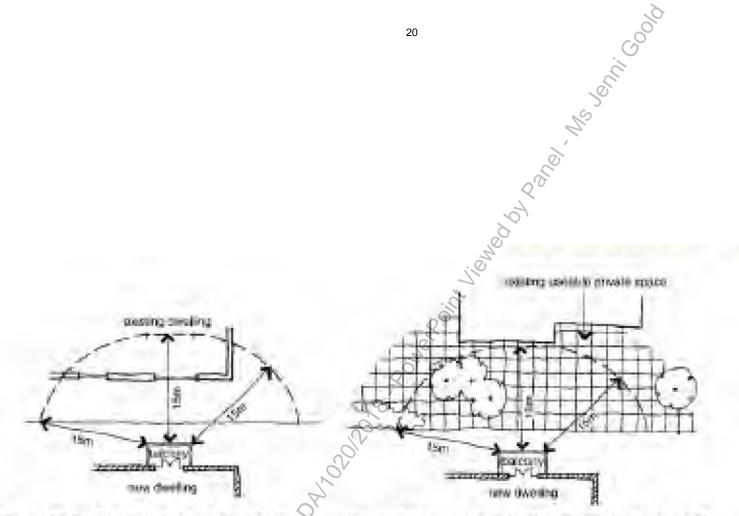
direct view occurs if windows or outdoor areas overlooked are located within a horizontadistance of 15 metres from any point of the balcony or deck.
